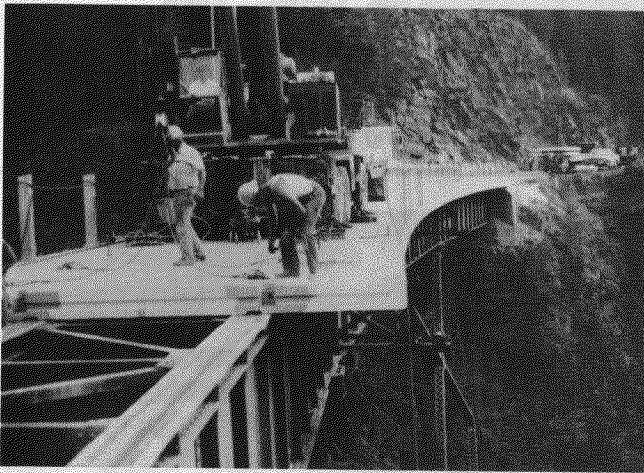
Placement of the deck panels on Big Dick Creek Bridge.
